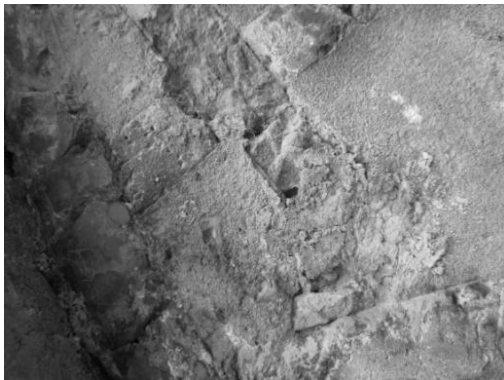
Kirk Kizlar tomb, Niksar; exterior salt efflorescence damage © R. McClary
